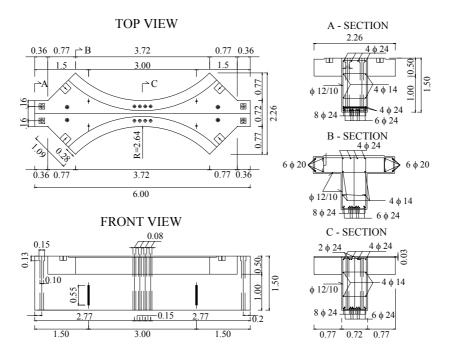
Geometrical details (dimensions in m) and reinforcement arrangement for the curved beams.
